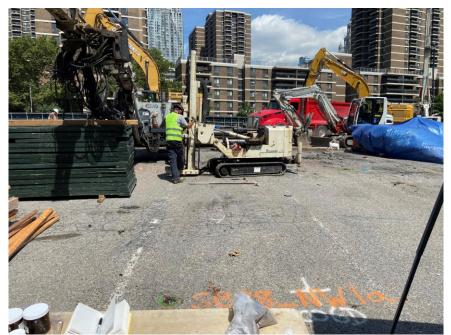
Lakewood advancing a soil boring in the south-central part of the site (facing north)
